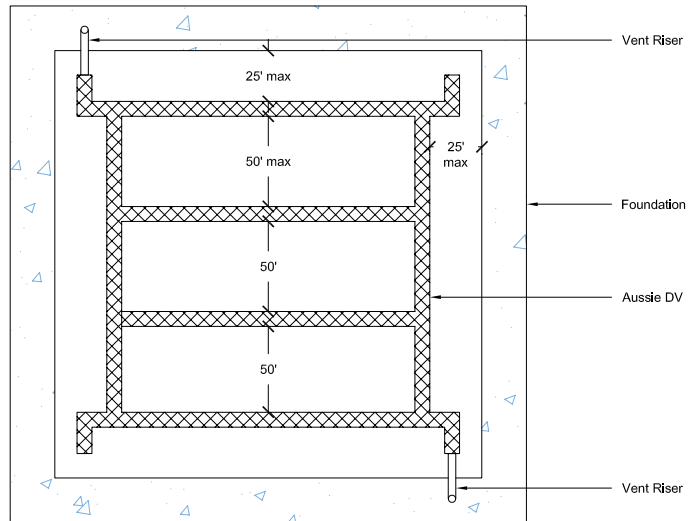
AUSSIE DV VENT LAYOUT- PLAN VIEW
